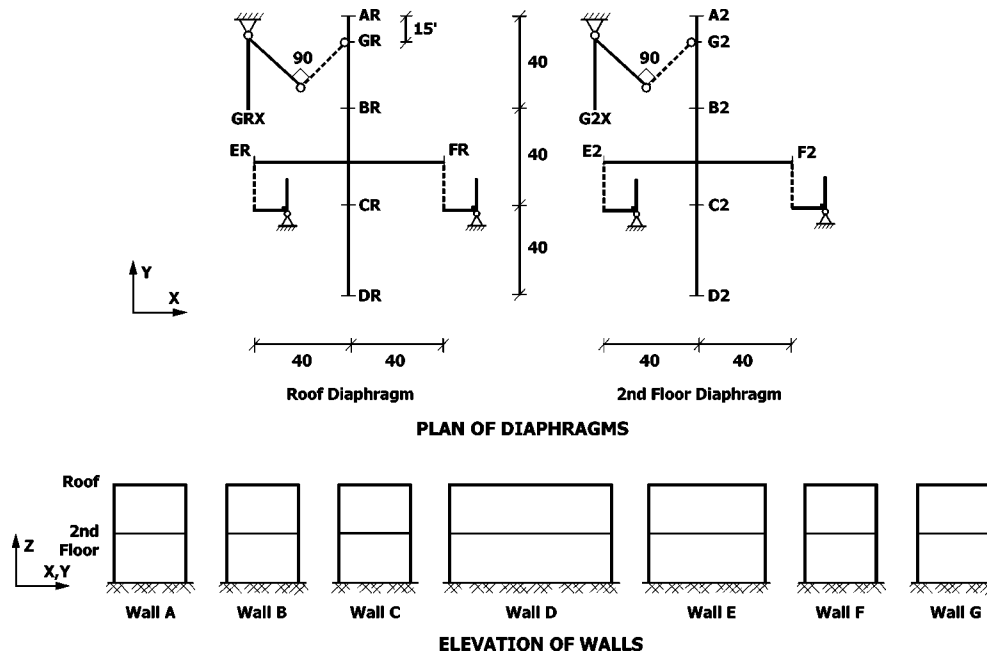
Pseudo-3-D model for the building with an inclined wall.
